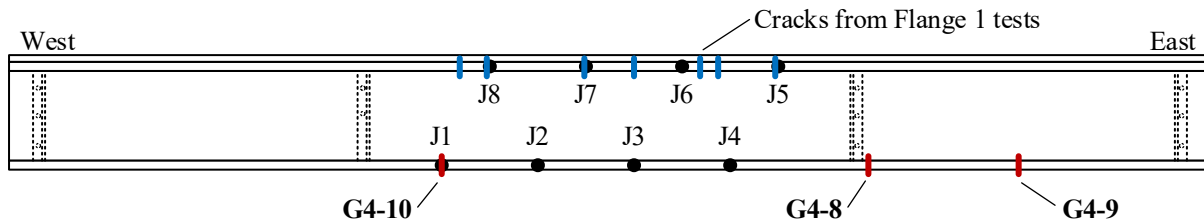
Illustration. Instrumentation layout for Girder 4 - Flange 2 (looking north).
